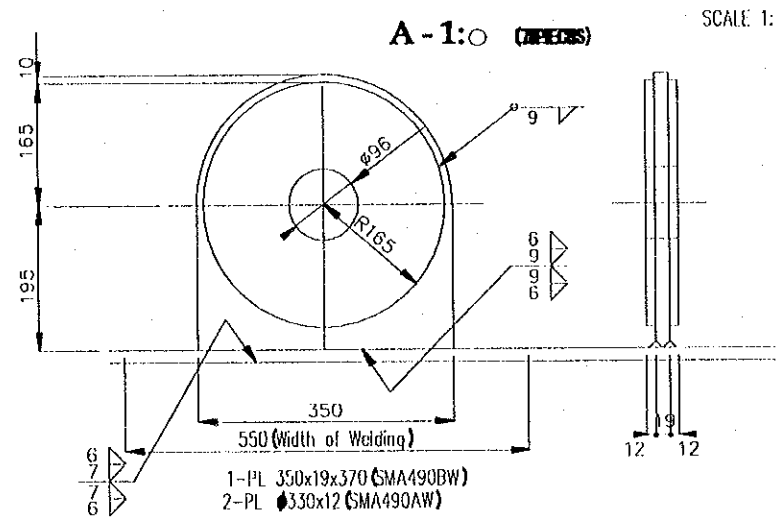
# DETAIL OF EYEPLATE AND REINFORCE STIFFNER FOR ERECTION
